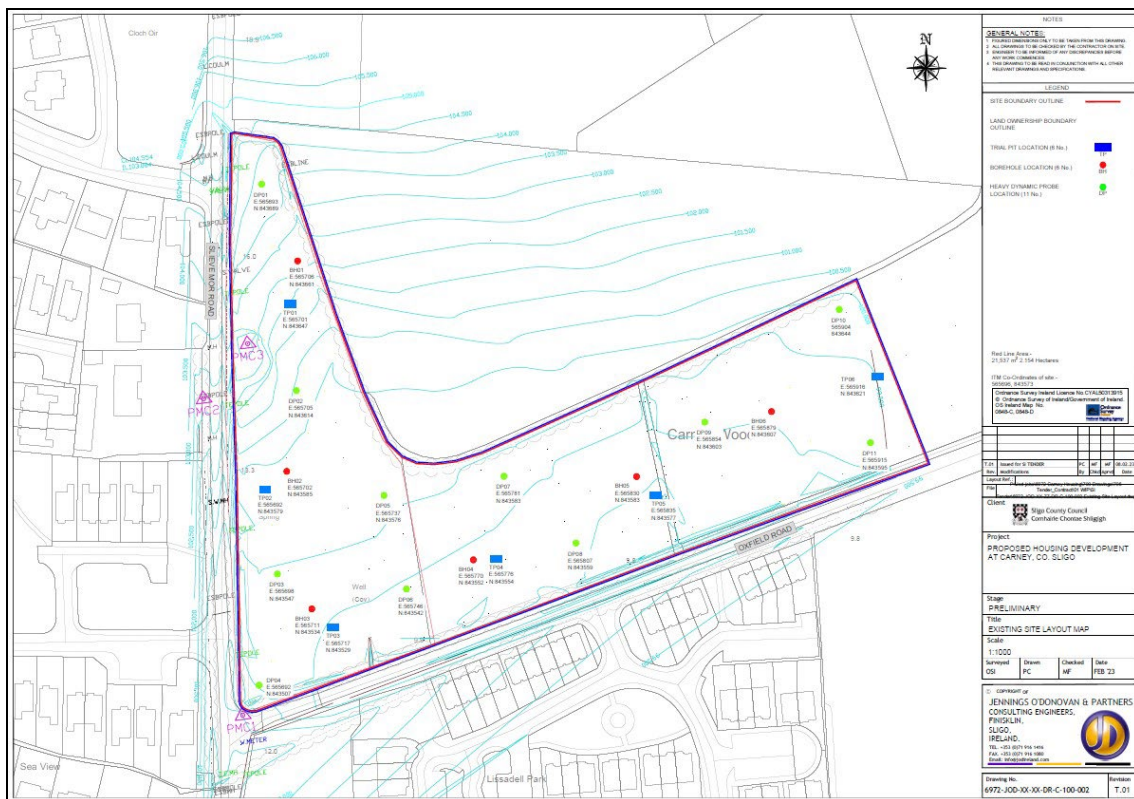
Site plan of Site Investigation works – Trial holes indicated in blue.
